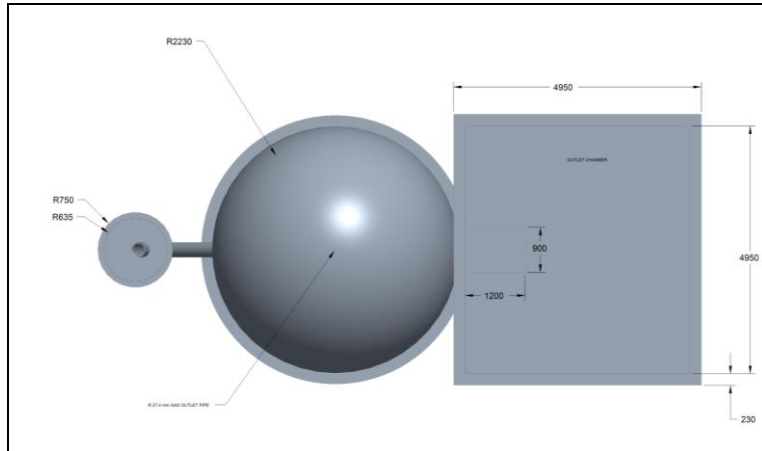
Side view of 50 m³ capacity modified Janta fixed dome biogas plant
